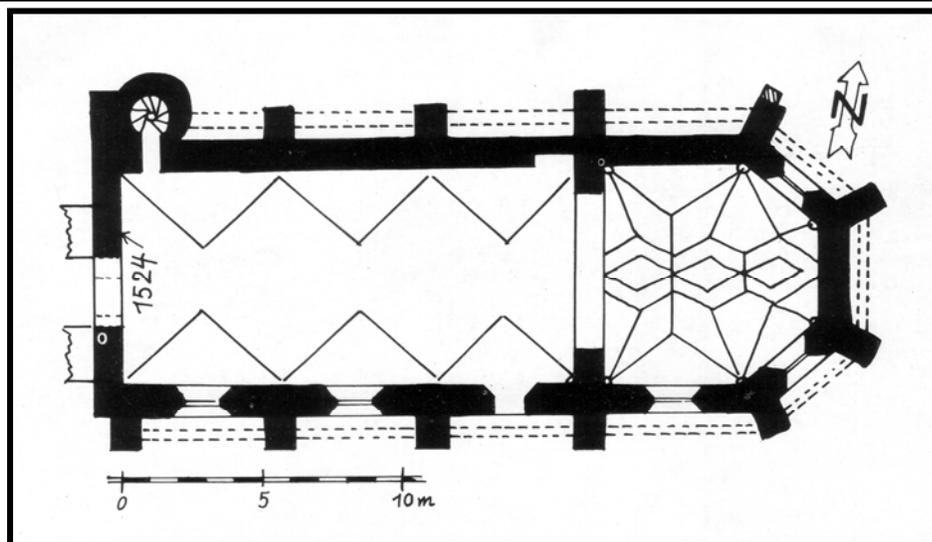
Schematic of the Dupuş church with vaulting and stairs to the fortified roofing.
